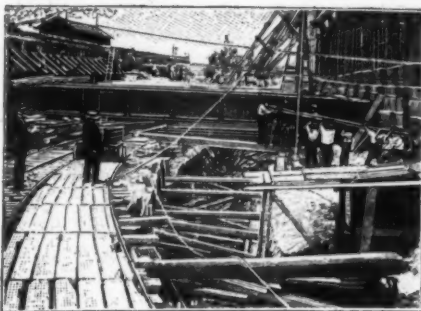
LAYING OF THE METALLIC FLOOR NEAR THE NEW STATION.
